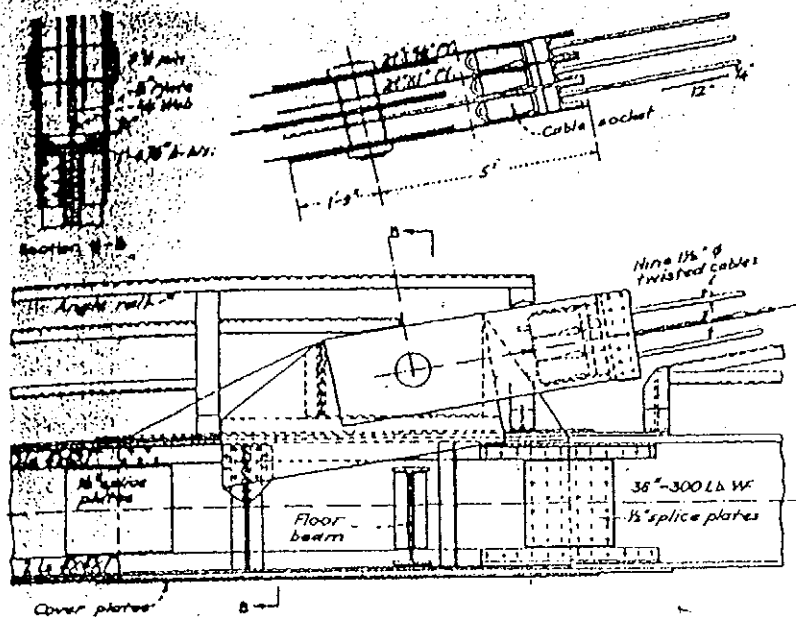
Anchorage detail of the Wabash River Bridge showing the self-anchoring arrangement.
